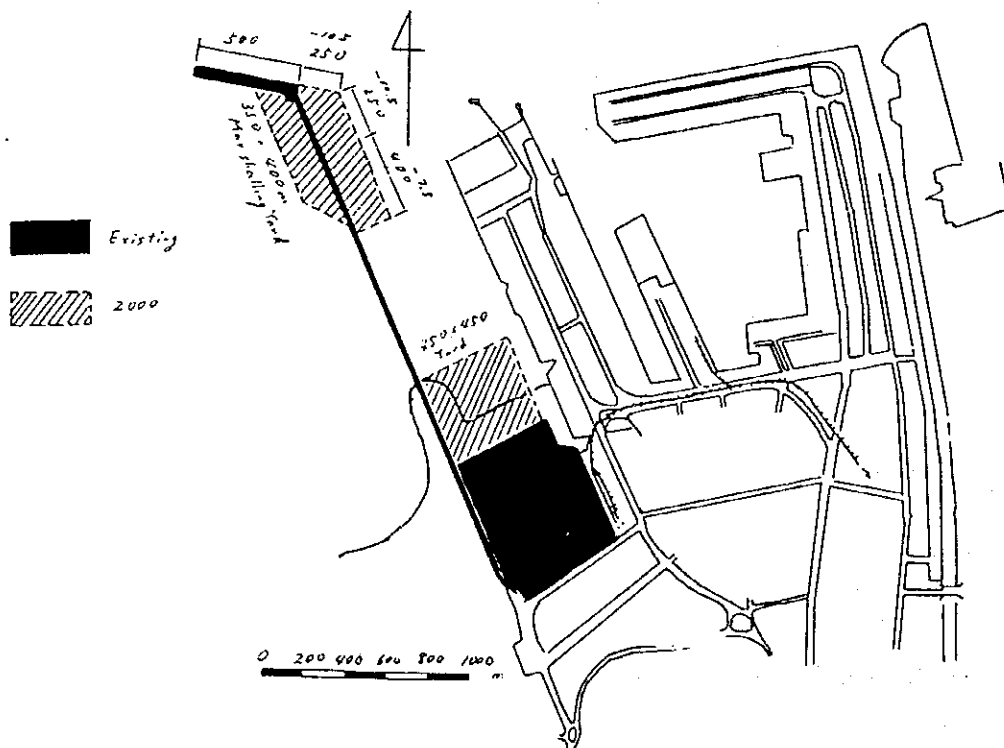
Existing Container Terminal Development Plan (6): Tanjung Perak (Surabaya)
